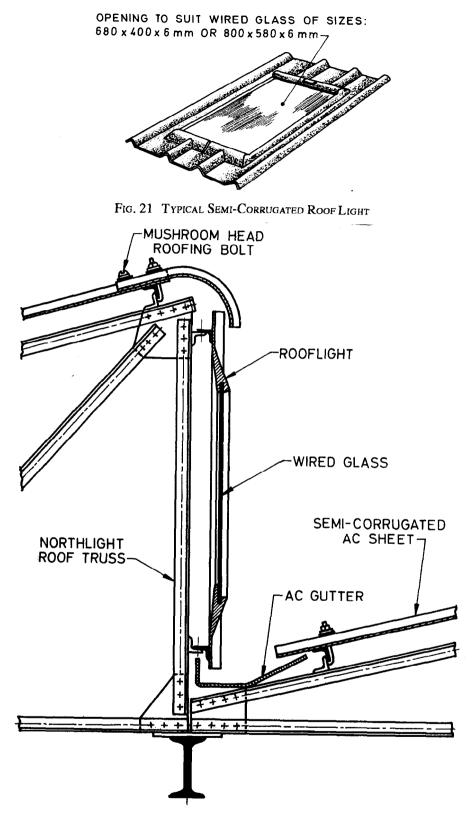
TYPICAL ROOFLIGHT USED AS NORTHLIGHT GLAZING
